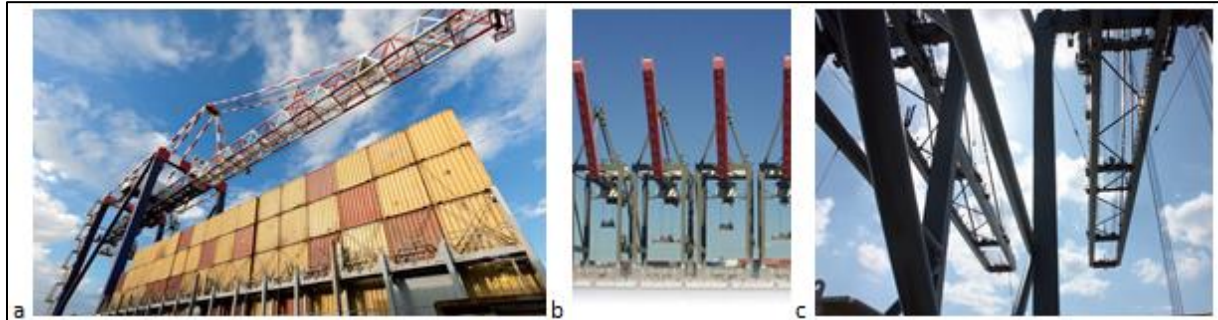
a) Lattice girder boom b) Mono box boom girder c) Double box boom girder
